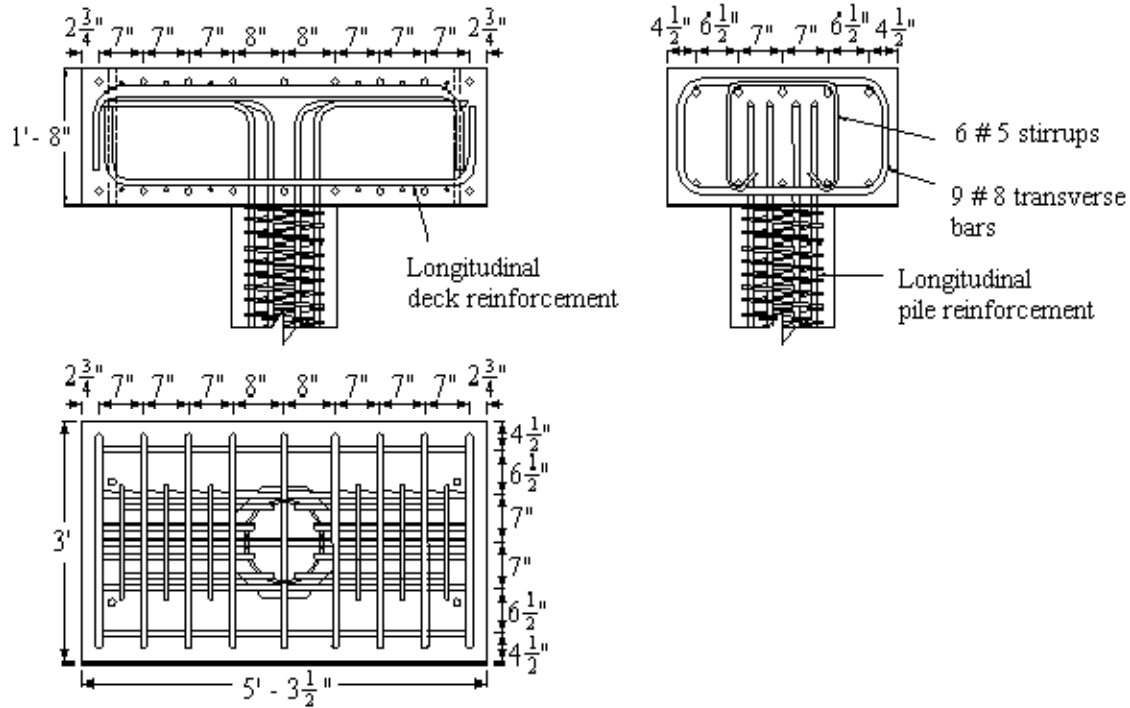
Deck Slab Section Reinforcement for Specimens 1–7
